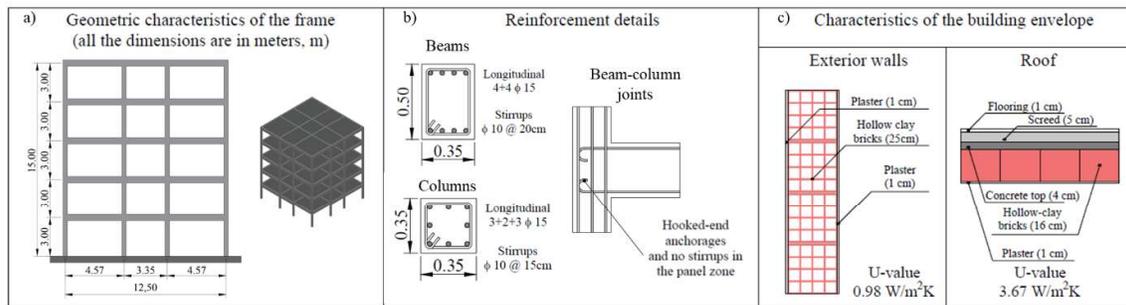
a) Geometric characteristics of the RC frame building, b) reinforcement details, and c) geometric characteristics and properties of the building envelope.
